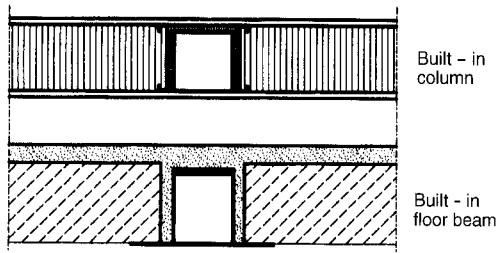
When beams and columns are built into floors and walls, they do not obstruct space and require little or no additional fire insulation
